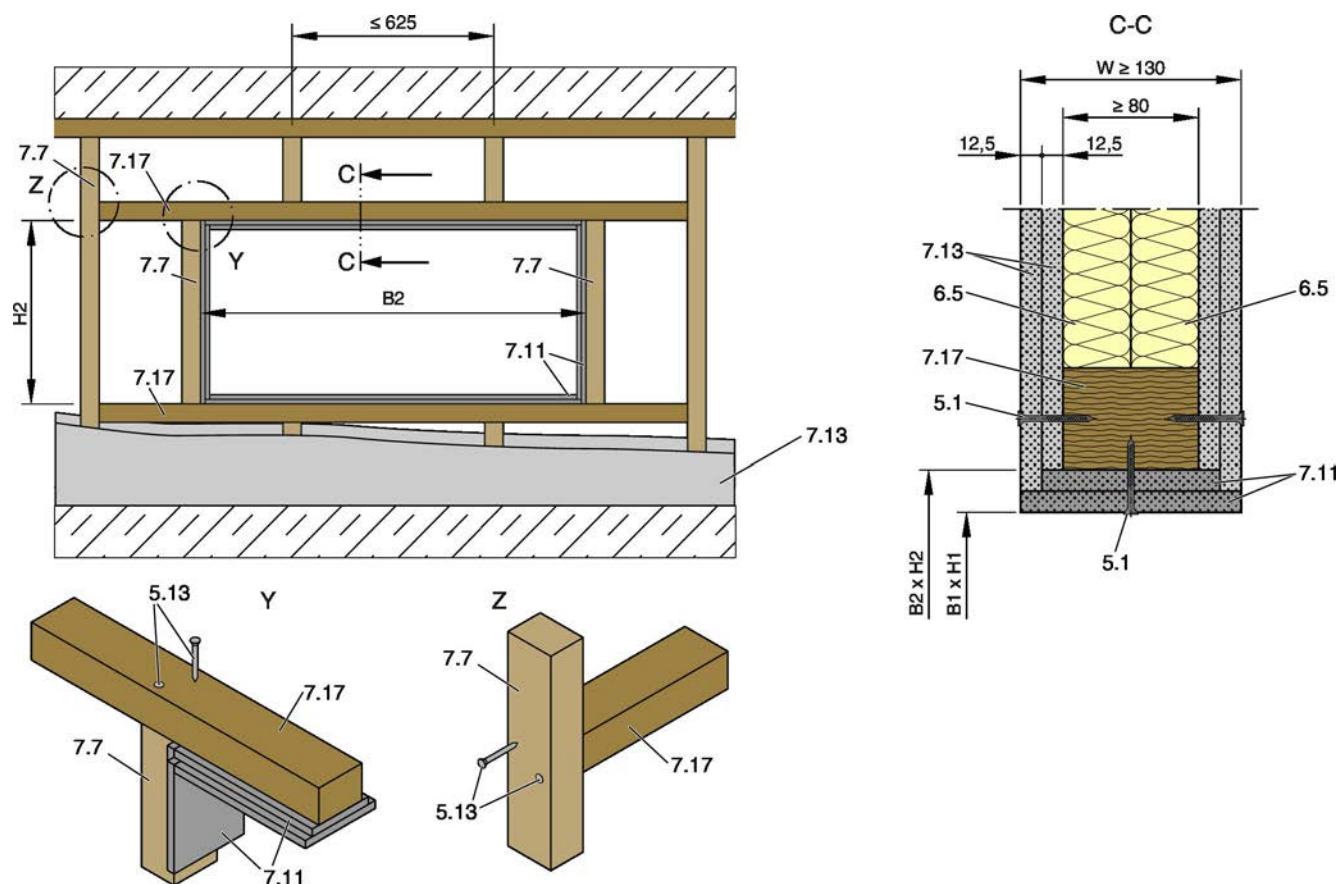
Lightweight partition wall with timber support structure and cladding on both sides
